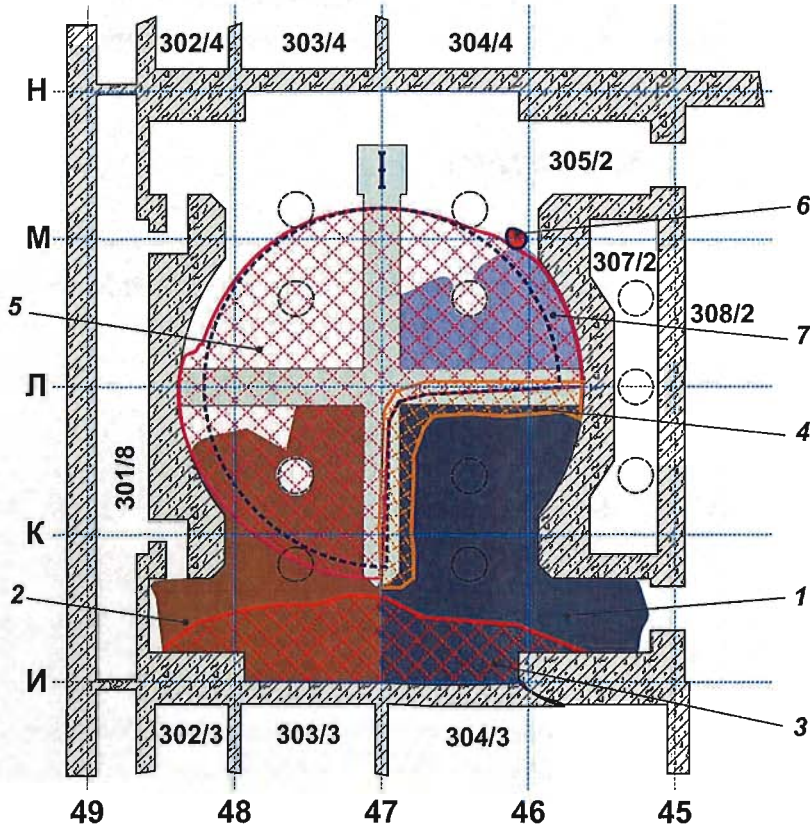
Layout of FCM accumulations in Room #305/2
